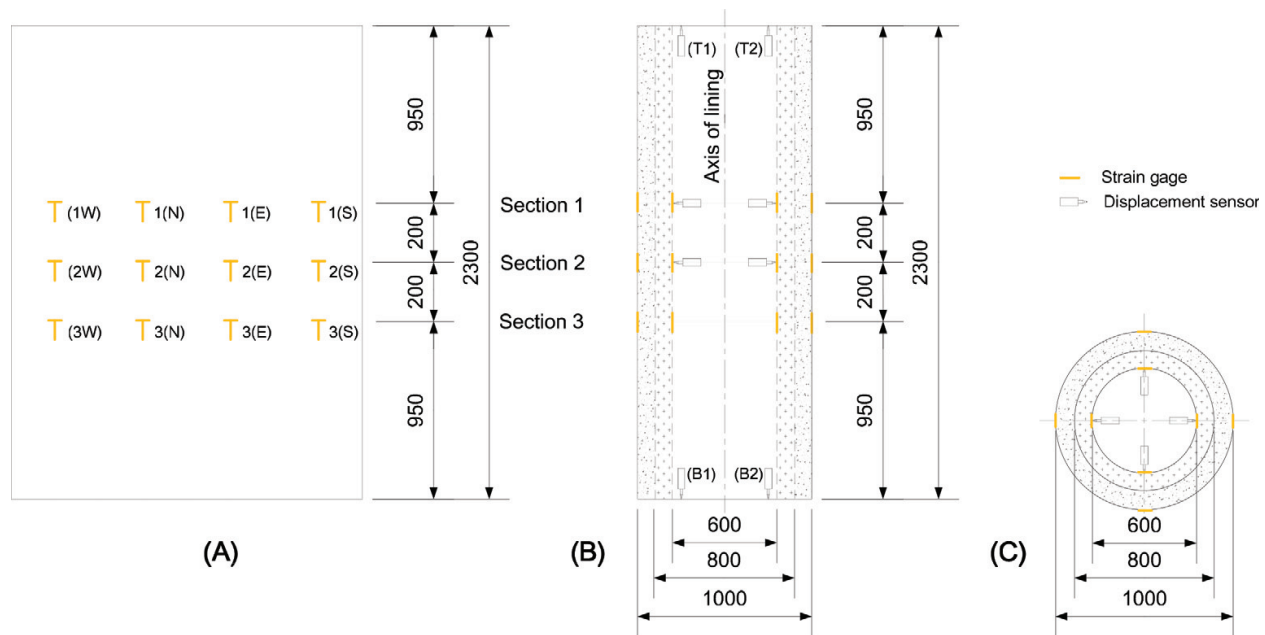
Layout of monitoring points (mm): (A) unfolded section; (B) vertical section; and (C) horizontal section.
